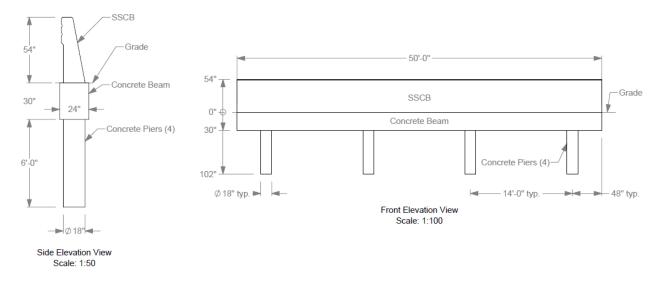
Concept 3 – Drilled Shaft with Concrete Beam Design.
